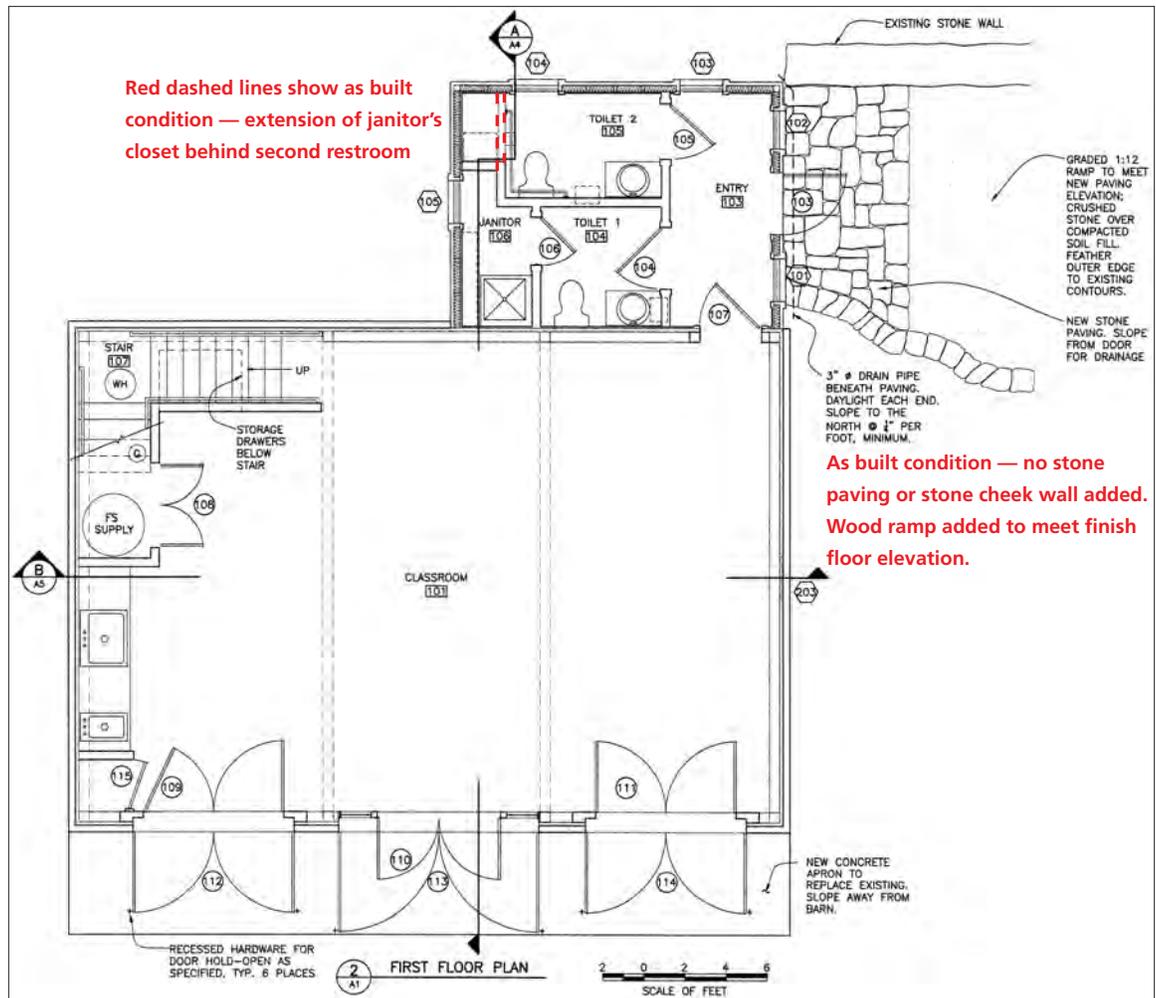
Rehabilitated Burlingham Barn first floor plan. The upper right of the plan shows the accessible restrooms in the annex. Plan view, 2002 (NPS).
